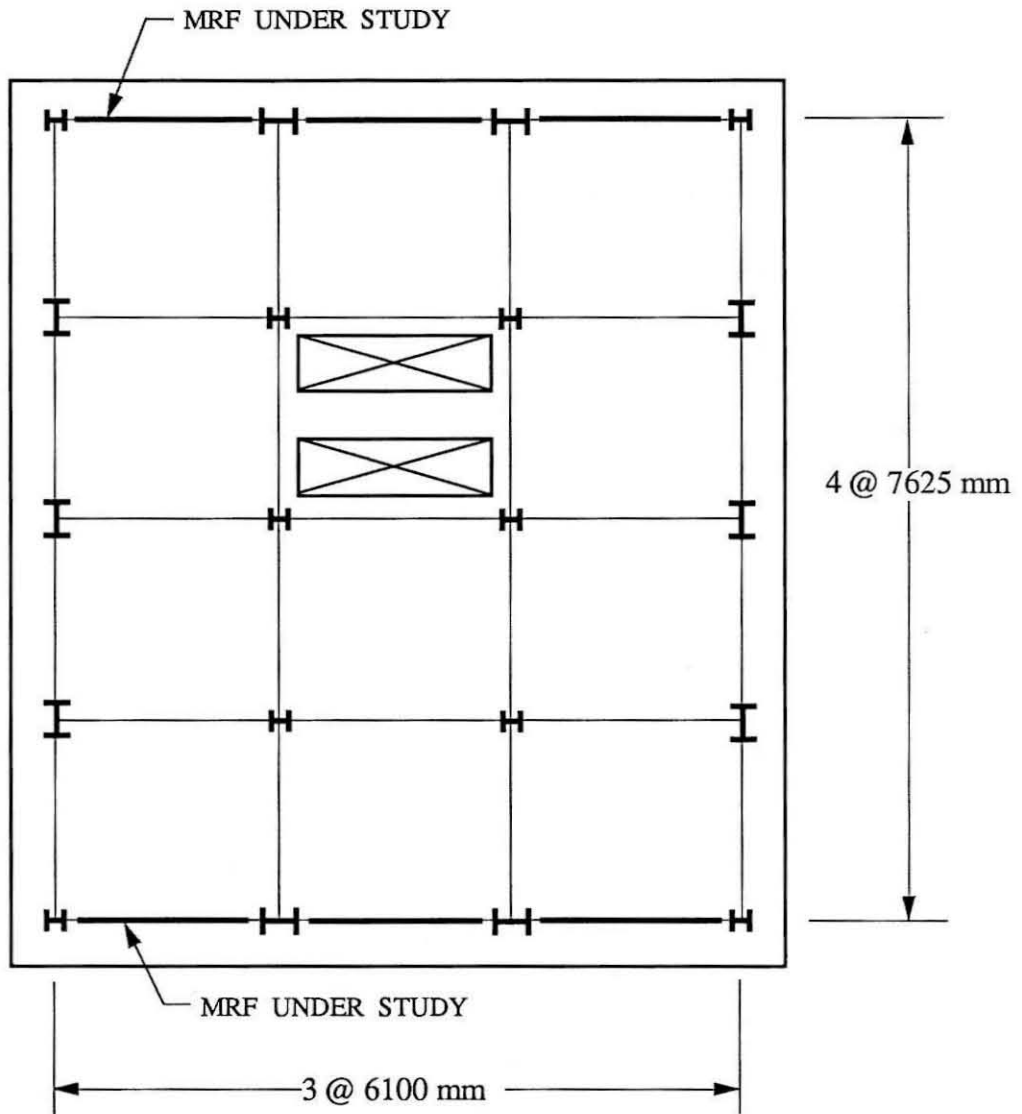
Typical floor plan showing the framing in the twenty-storey office building.
